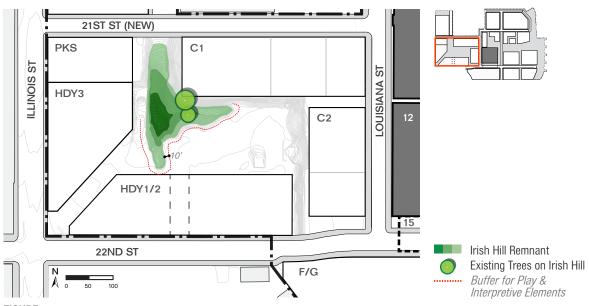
Enlarged Plan of Irish Hill Remnant
